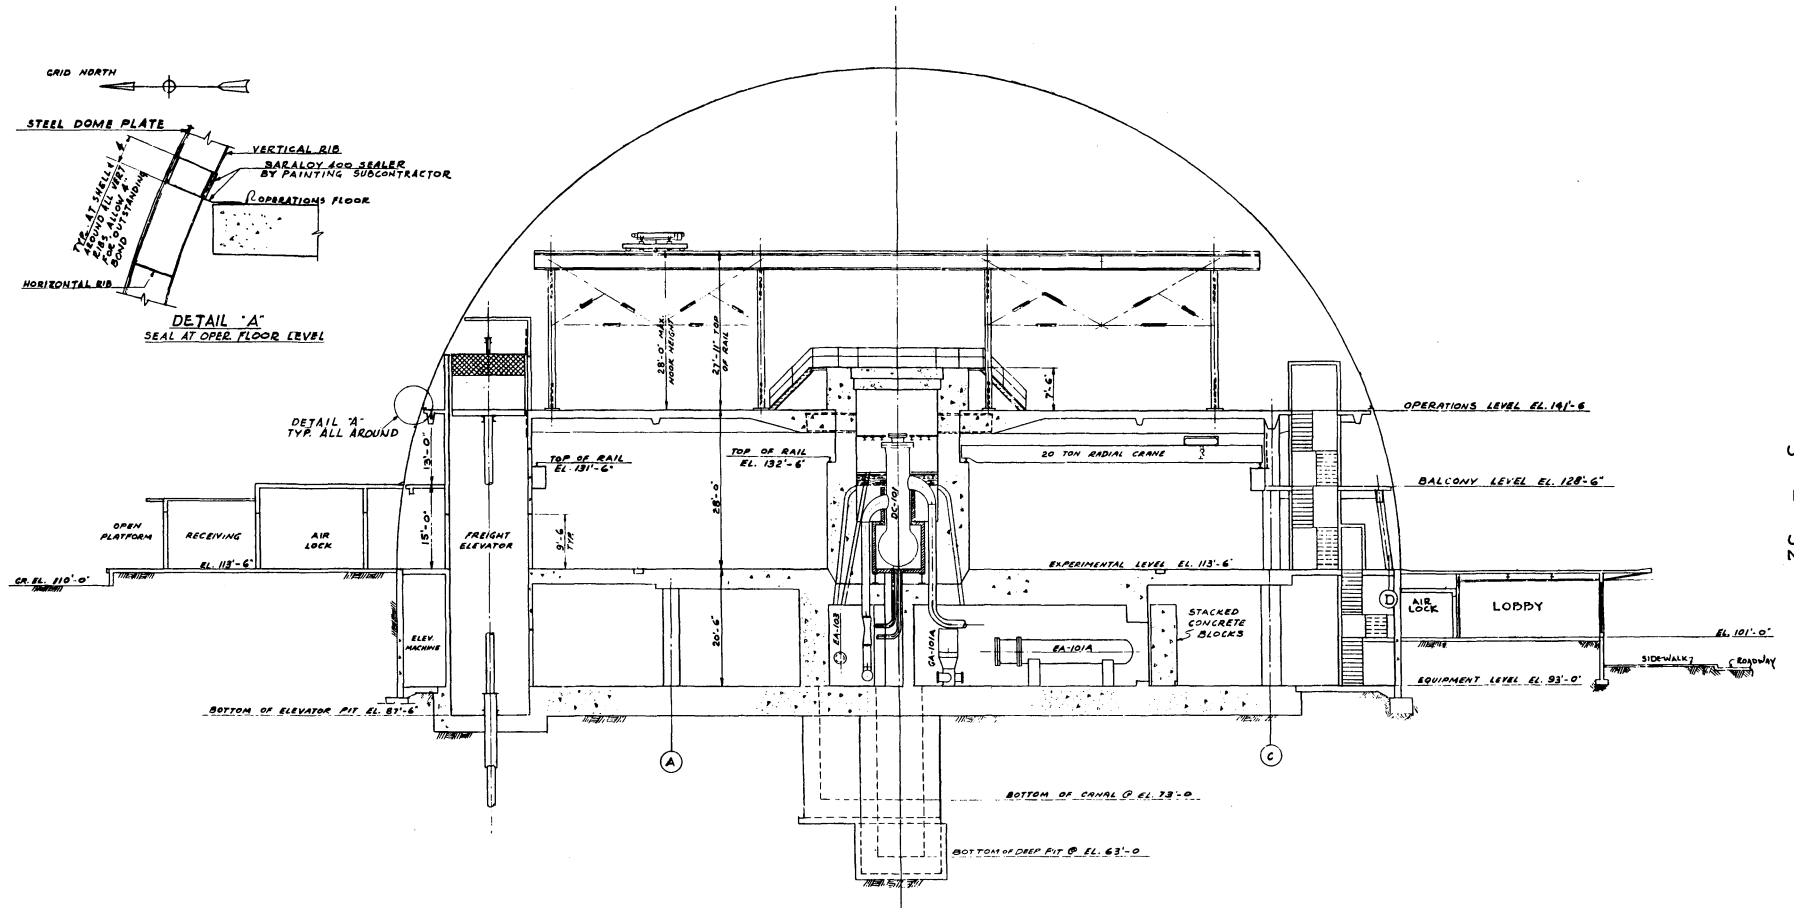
Elevation of the HFBR building in the north-south direction.
